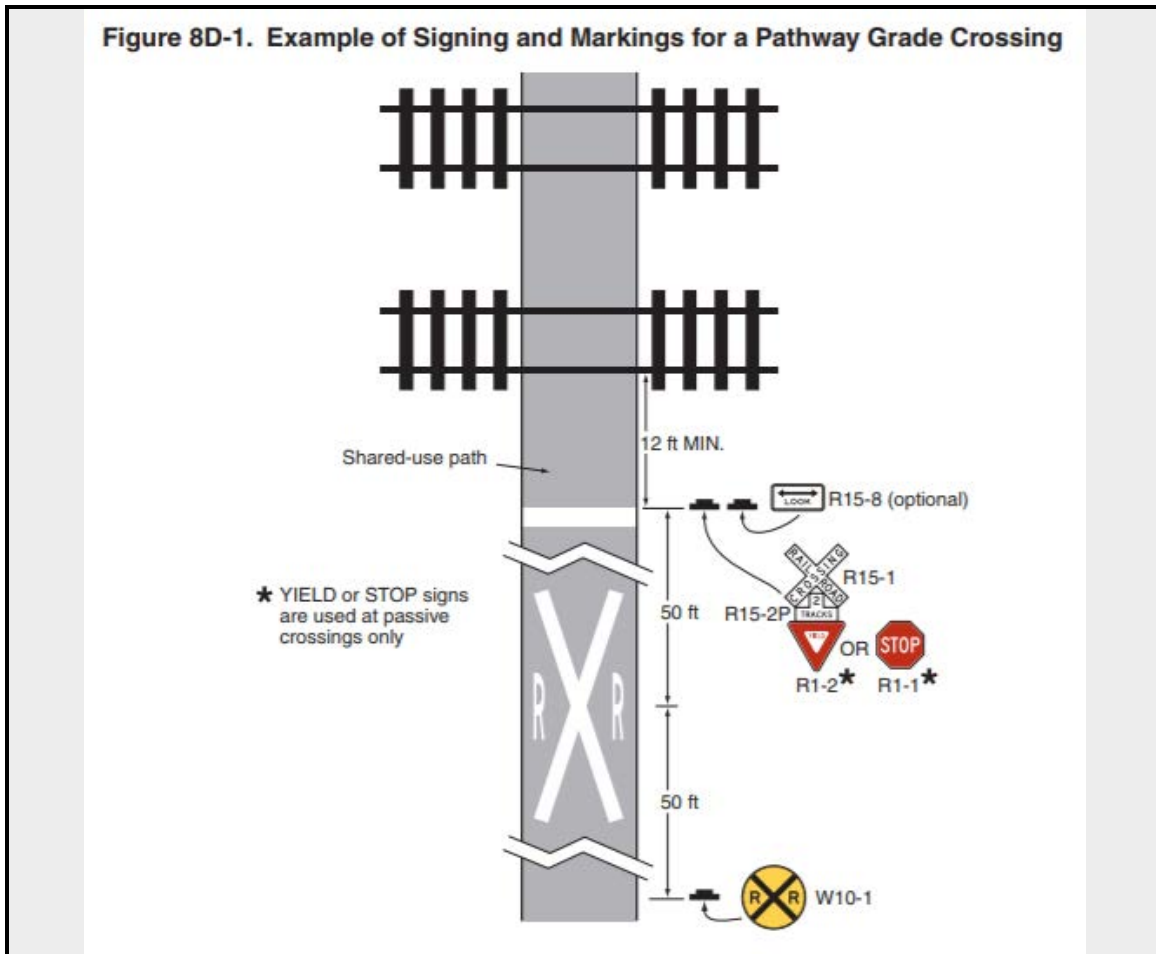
Railroad-Pathway Crossing Signs and Pavement Markings Placement (MUTCD)
